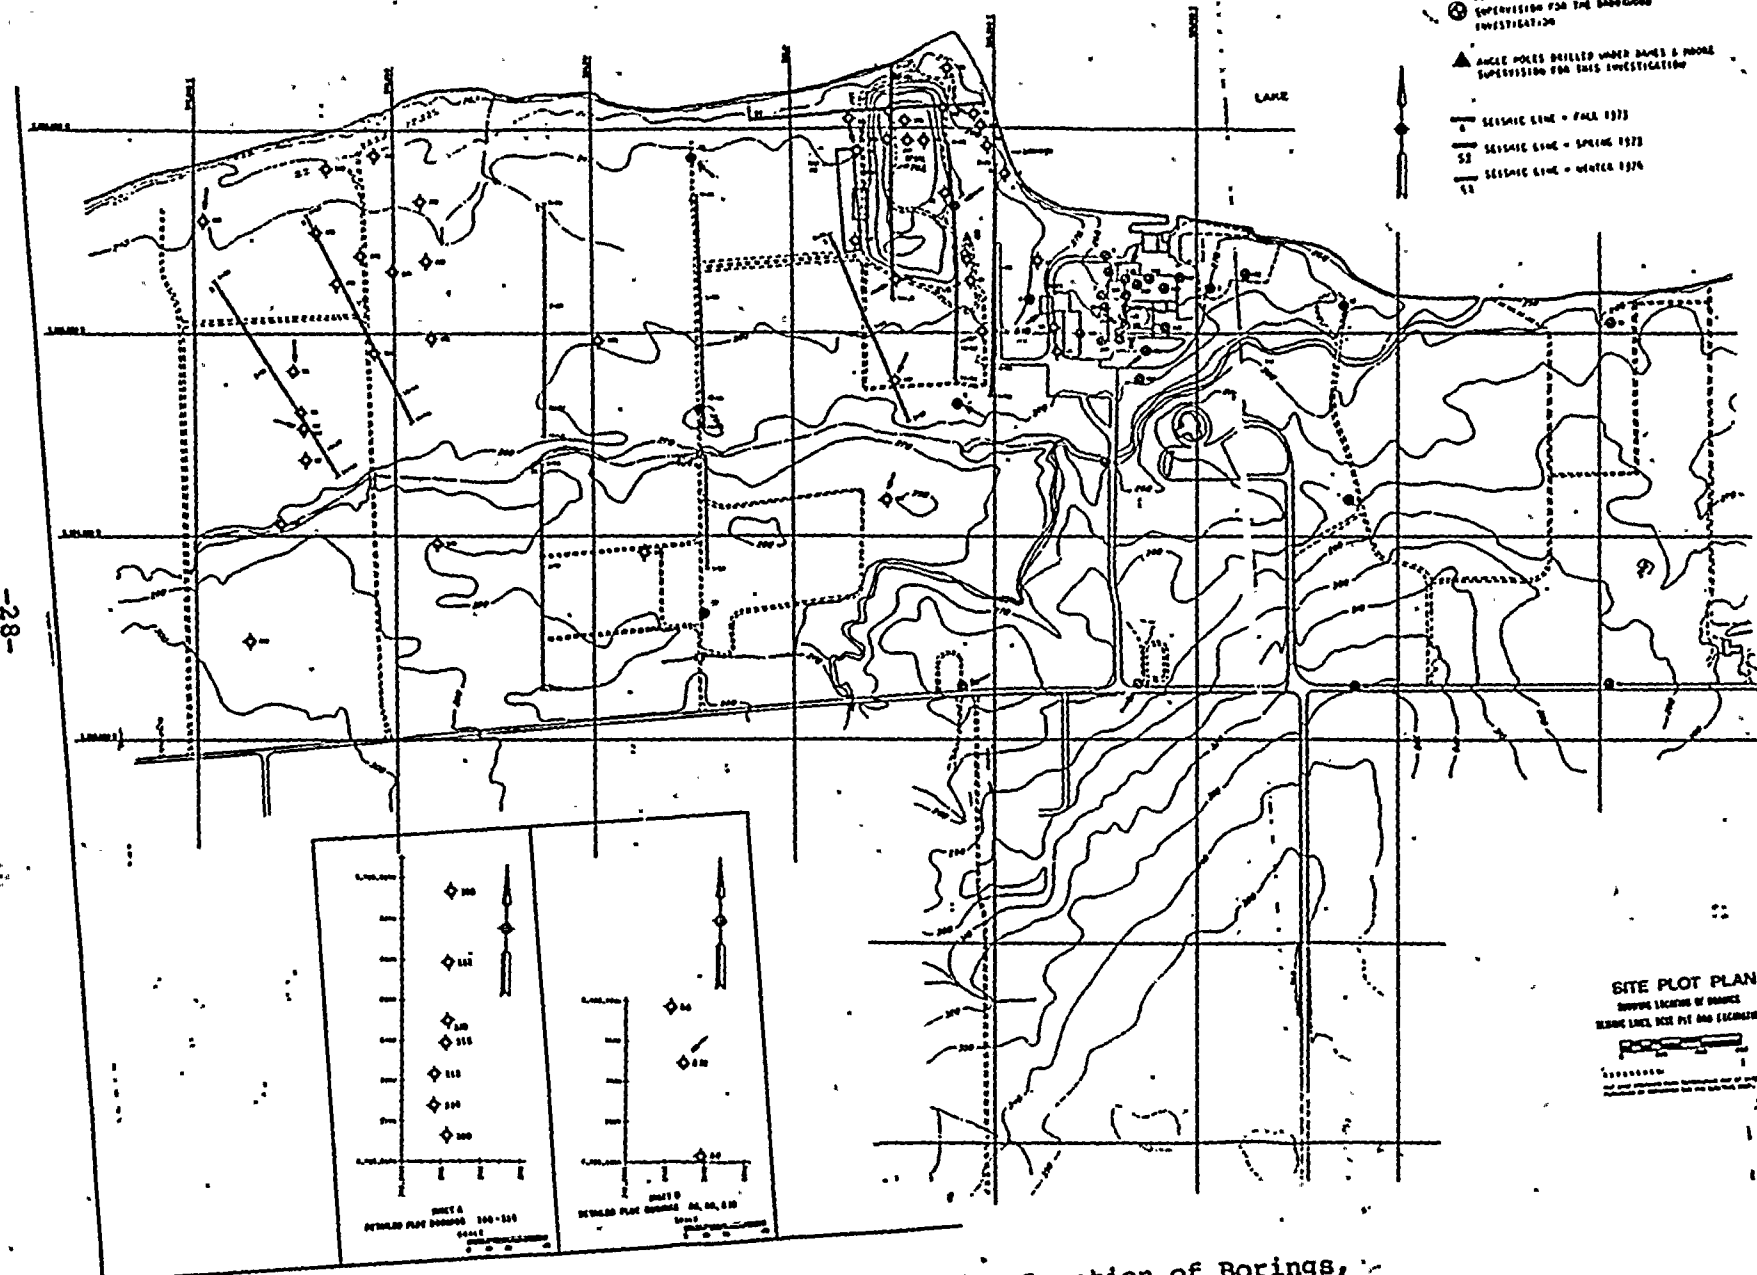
Site Plot Plan Showing Location of Borings, Seismic Lines, Test Pit, and Excavation
